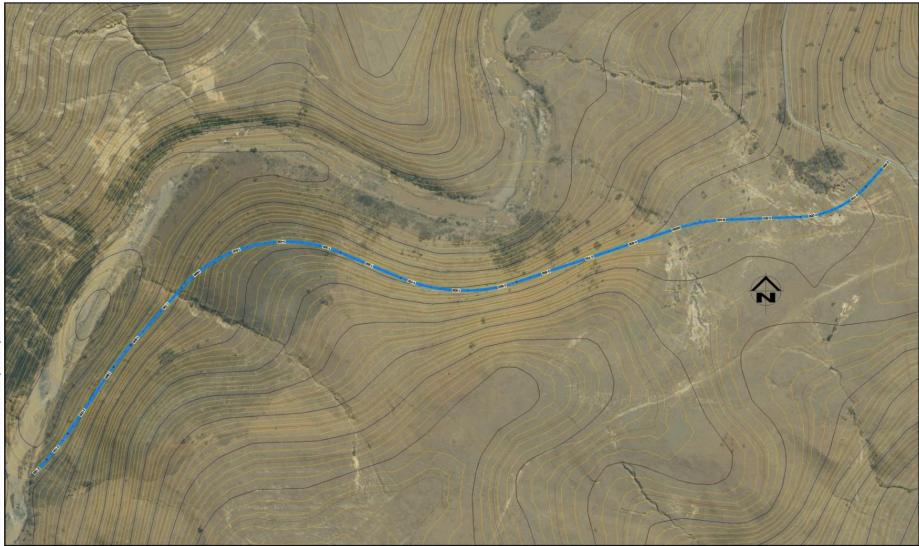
Smithfield Dam – Contour plan of the gauging weir downstream of Smithfield Dam
